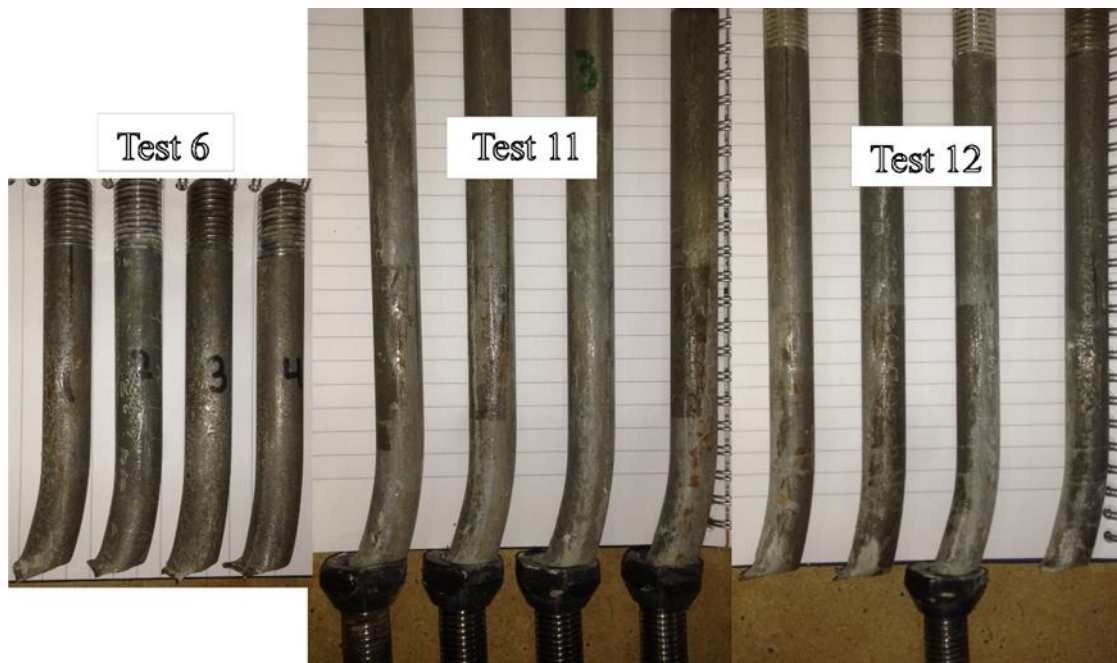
Deflected shapes of the bolts from push-out Tests 6, 11 and 12
